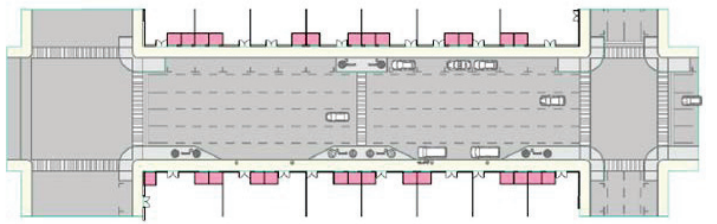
Image showing street plan where street trading is accommodated (Complete Streets Design Guideline, 2019)
